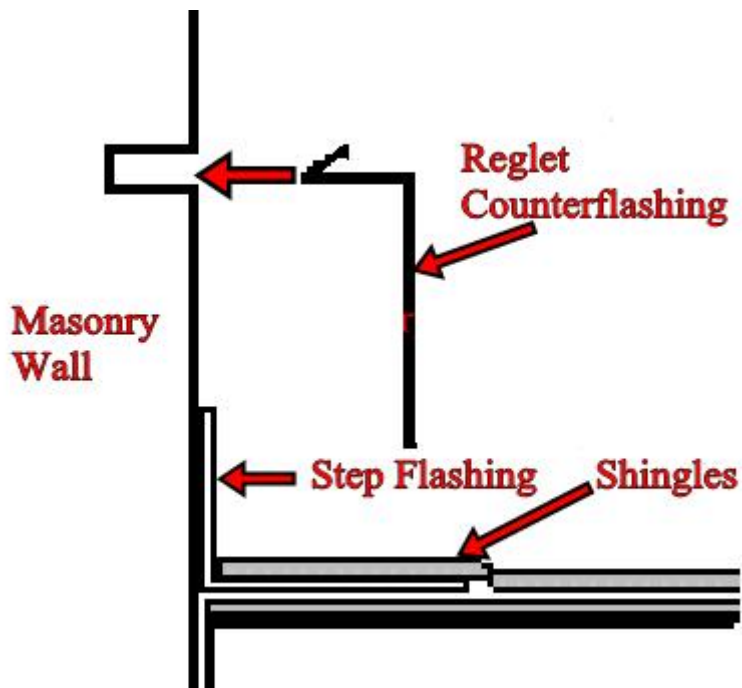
Example of Reglet Flashing (courtesy of Old House Web).
